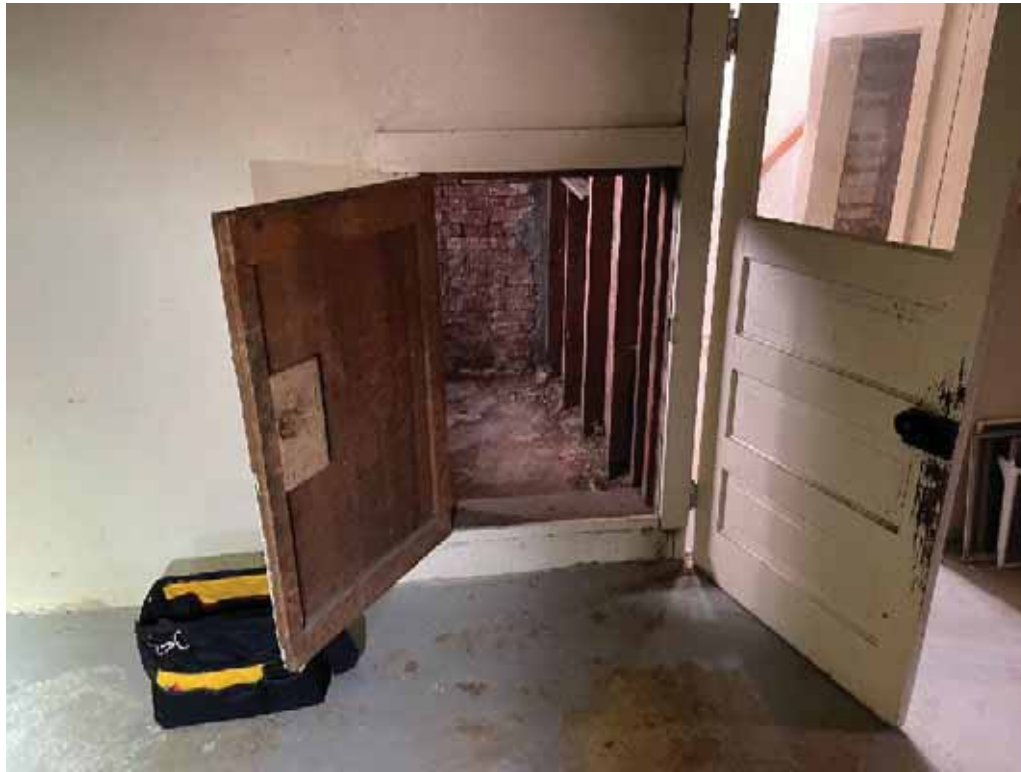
Little to no support for basement wall head at west side of opening into basement Room-4
